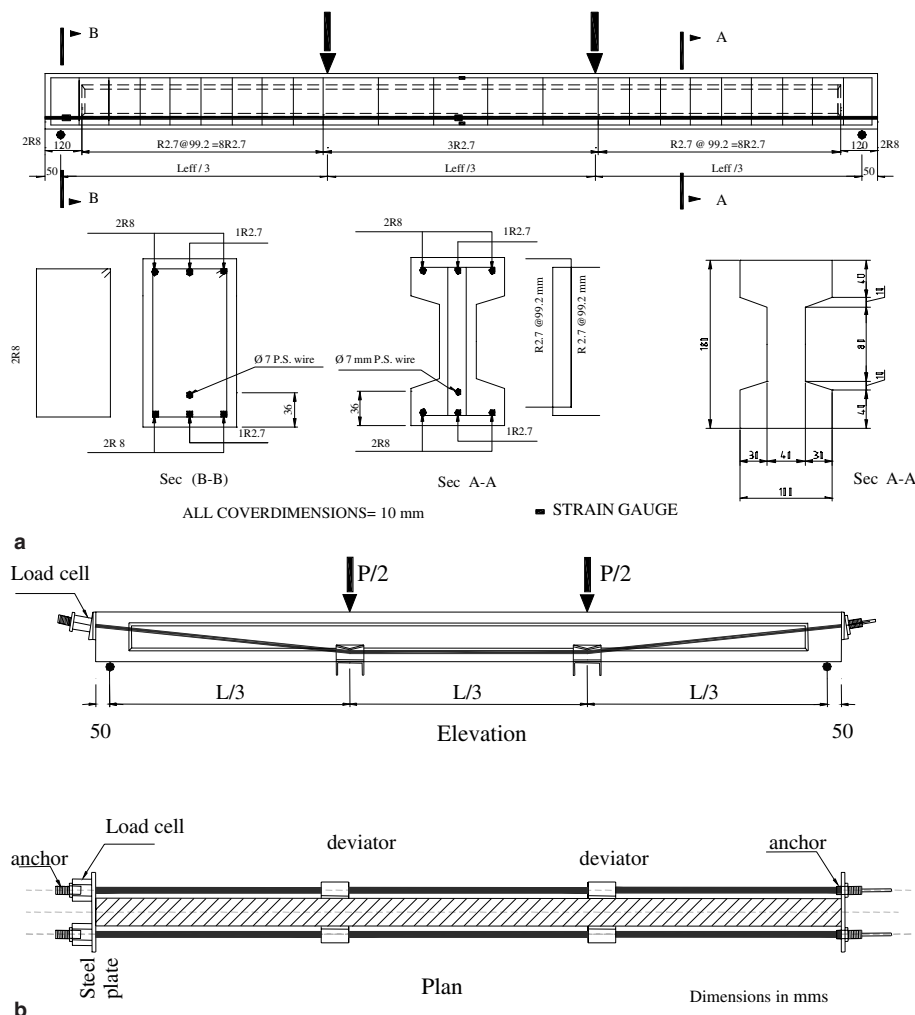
(a) Dimensions and reinforcement details of beam test. (b) External prestressing tendons layout using two deviators at the third span.
